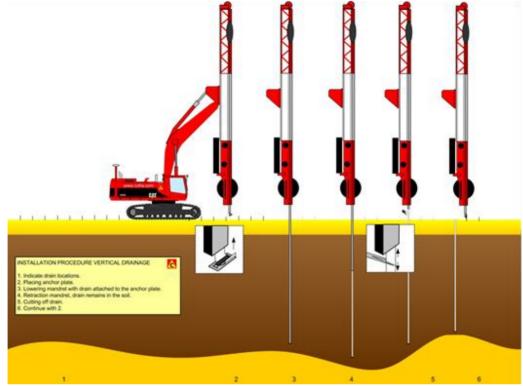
Principle of prefabricated vertical drain installation www.cofra.com
